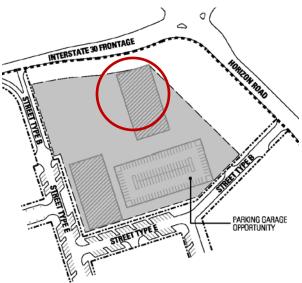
SUMMIT OFFICE SUBDISTRICT CONCEPT PLAN
